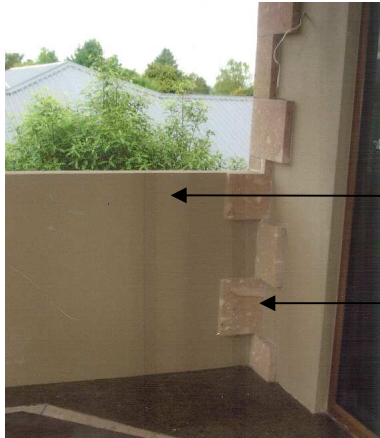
the interior of the spa pool enclosure showing the Hinuera stone detail at the corner of the house and connecting wall.
